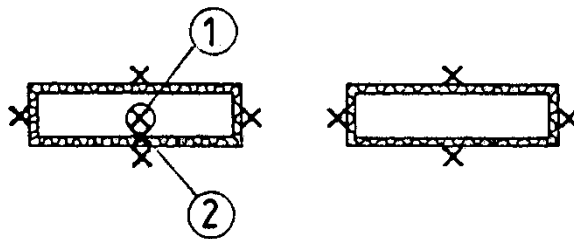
Location of thermocouples on vertical ducts outside the furnace
